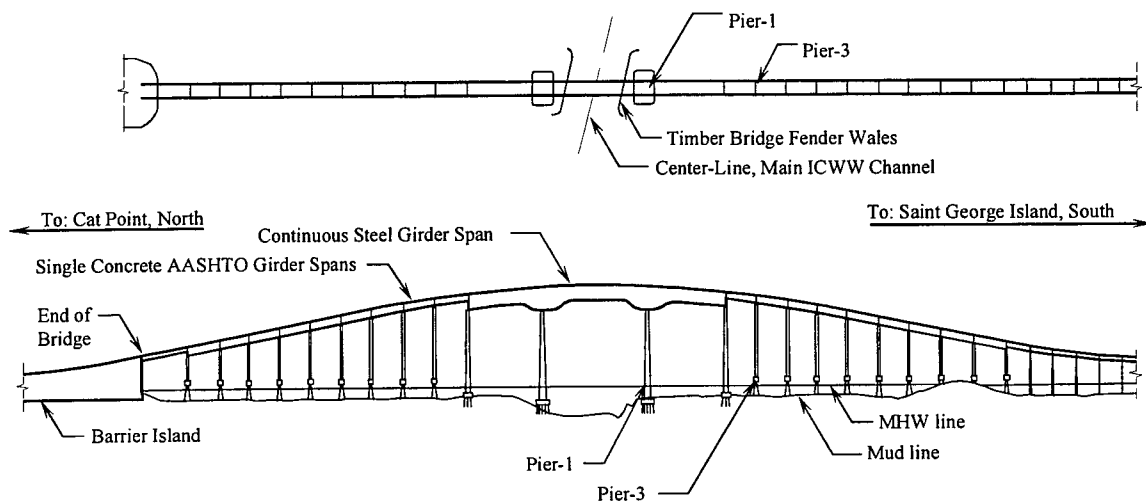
Elevation of Saint George Island Causeway Bridge
